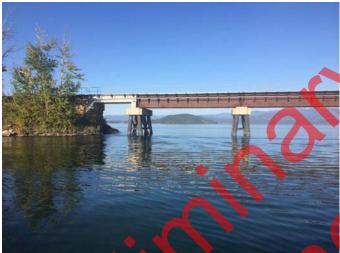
Bridge 3.9 – Close-up view of North end of Bridge
